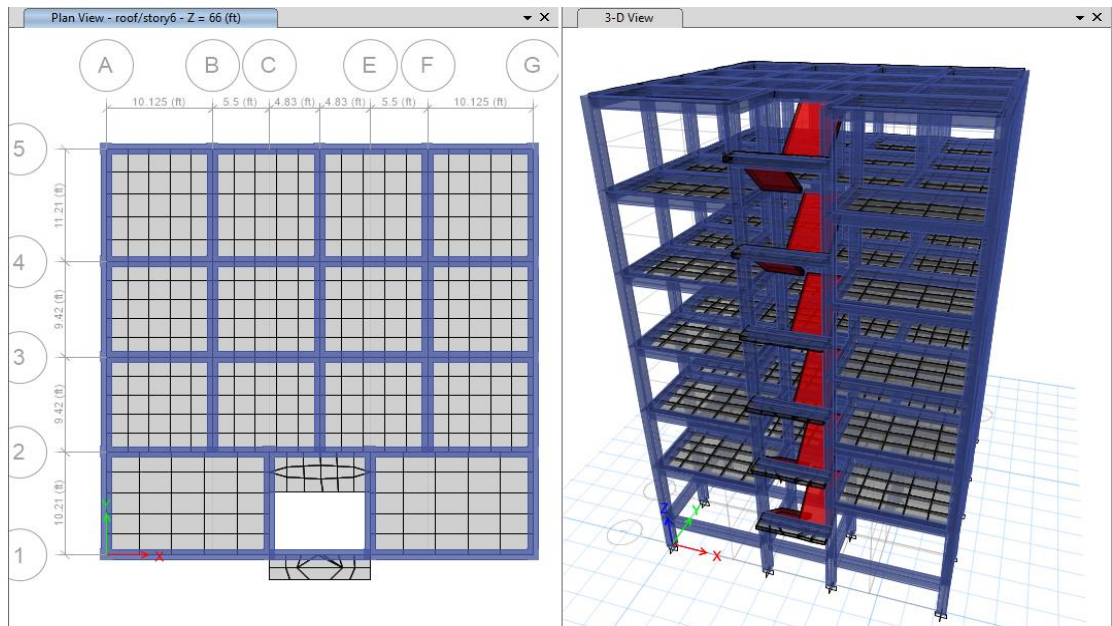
(G+6) story Residential Building plan view and 3D view
